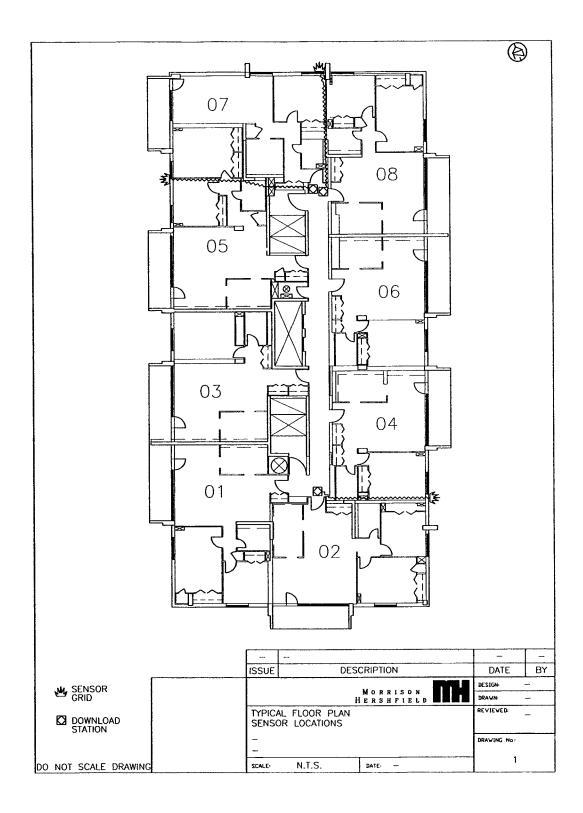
Drawing No. 1: Typical Floor Plan - Sensor Locations
